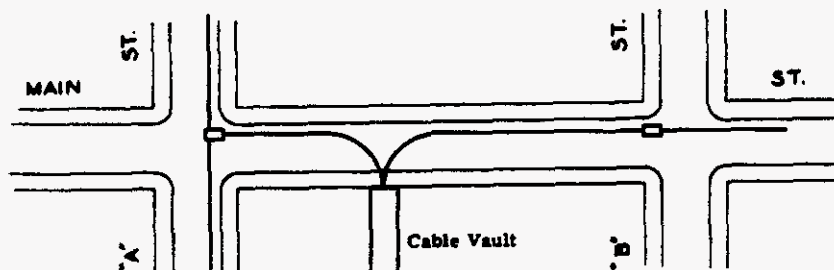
Conduit Entrance to Central Office Building When Conduit Run is on Opposite Side of Street.
